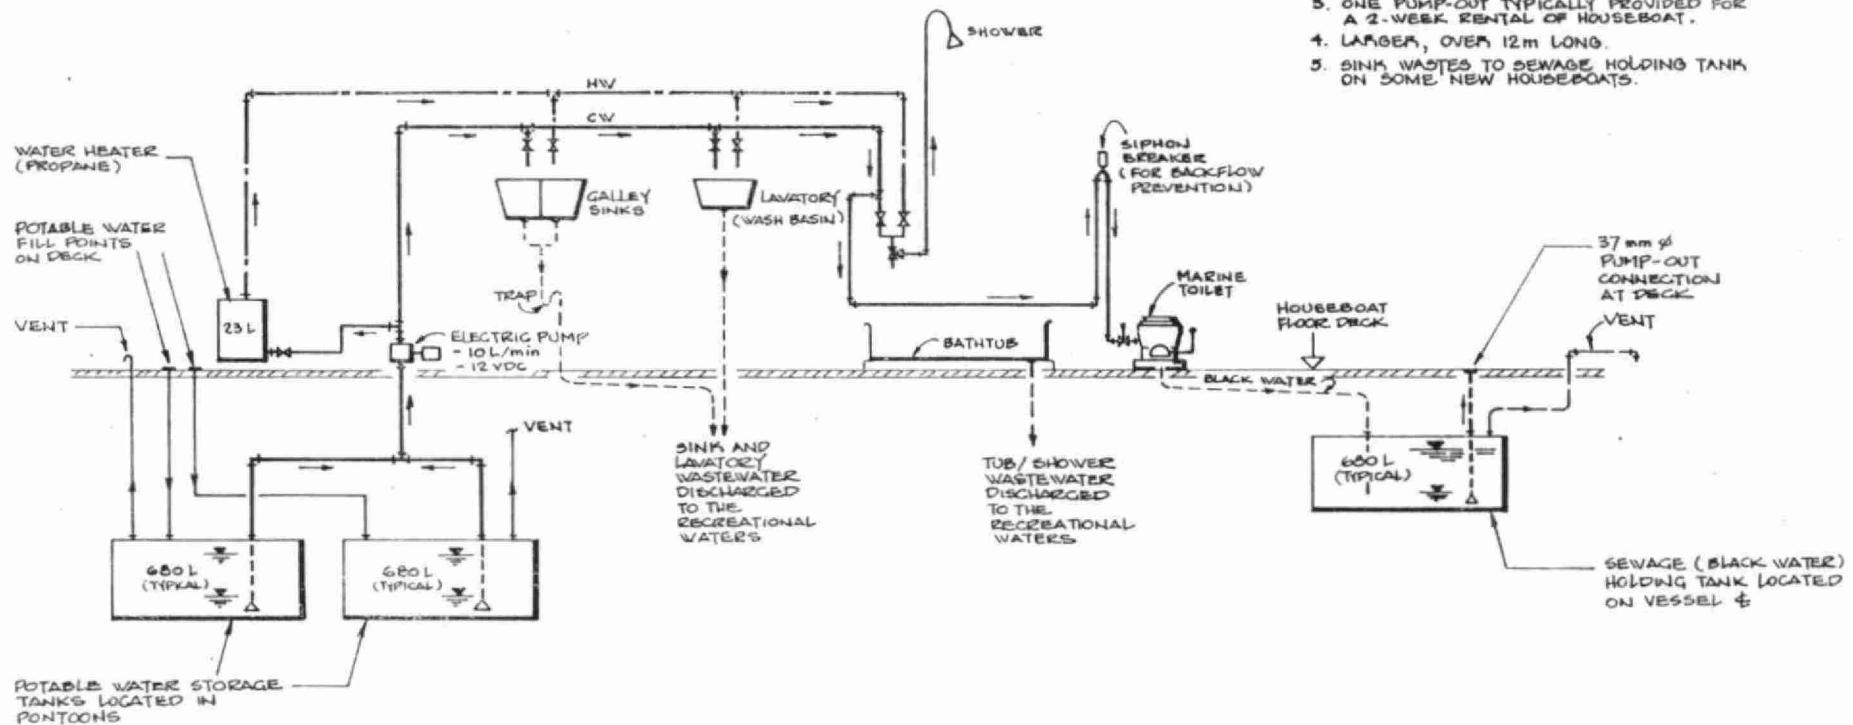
TYPICAL LARGER HOUSEBOAT PLUMBING SYSTEM
